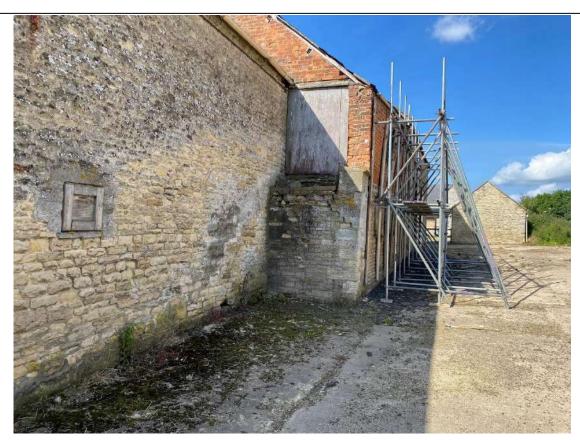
Outward Movement of First Floor Wall and Installation of Scaffold Shoring
